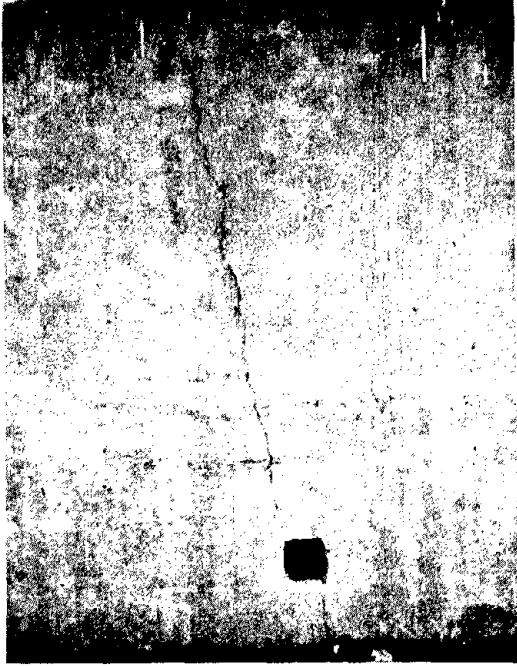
Minor cracking in abutment caused by differential settlement.
